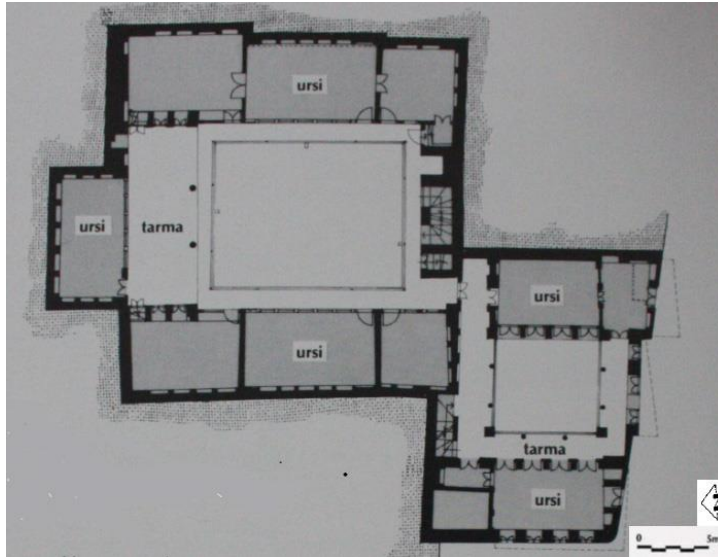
House 47 (first Floor Plan) Baghdad (Warren & Fethi 1982)
